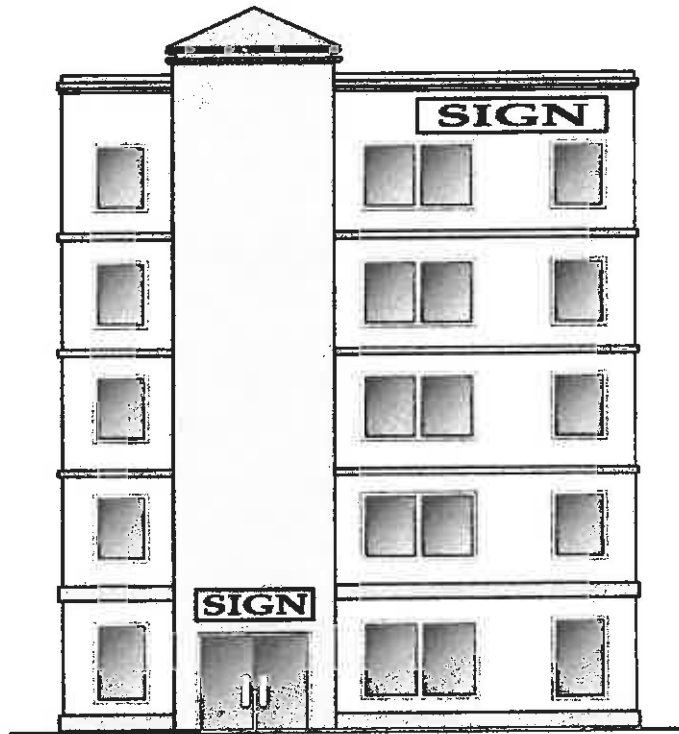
A-2: ALLOWED WALL SIGN LOCATIONS ON MULTIPLE-STORY BUILDINGS GREATER THAN THREE STORIES
